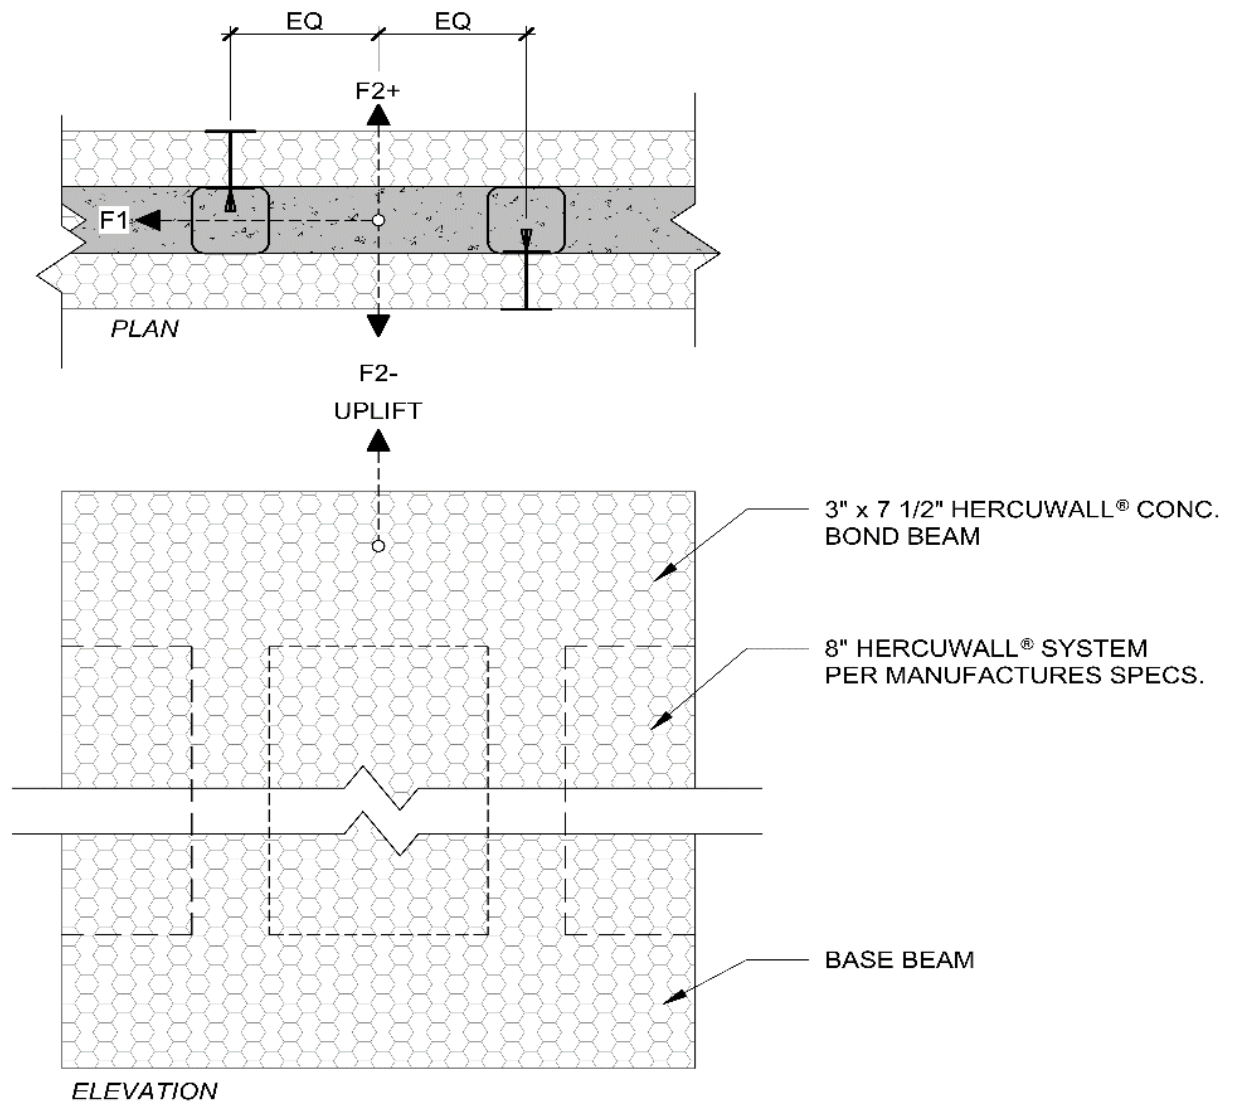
Load Diagram Truss Saddle Bracket and Embedded Connections
